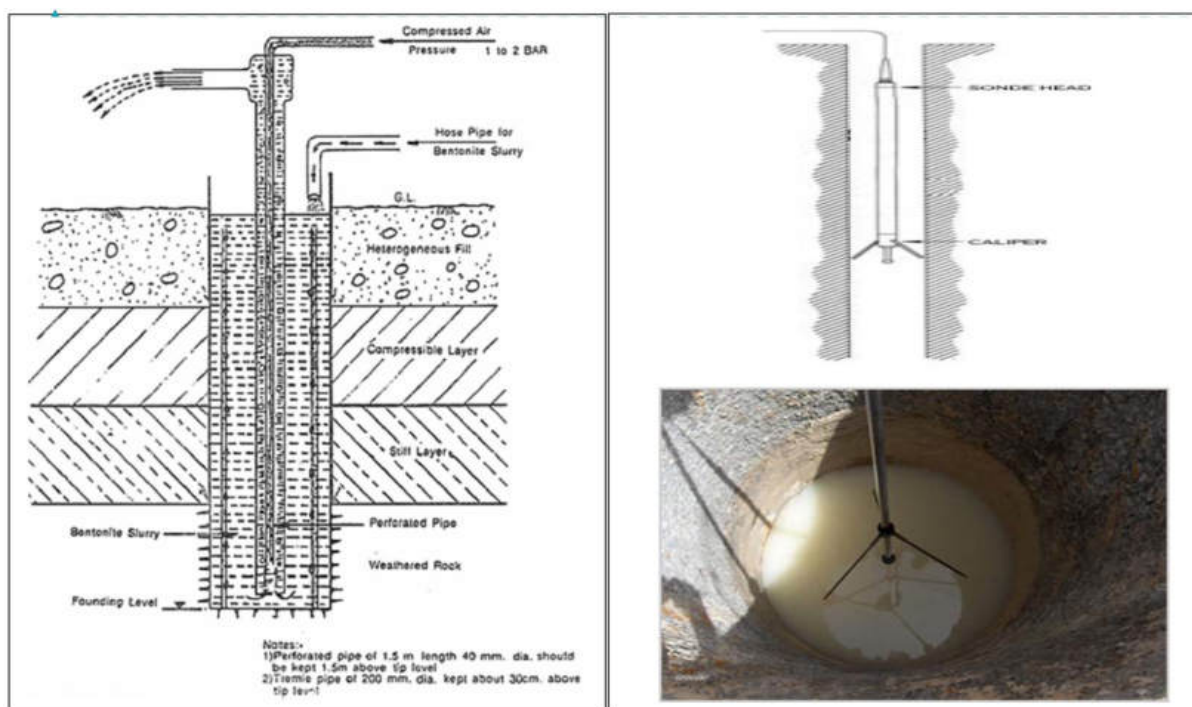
Typical Arrangement for Bottom cleansing (Left) & Hole Inspection by Mechanical caliper (Right)
